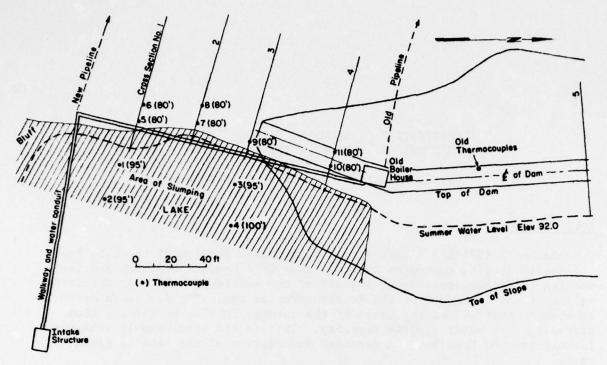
Location of drill holes with thermocouple assemblies and cross sections, Vortac Dam, Kotzebue, Alaska.
